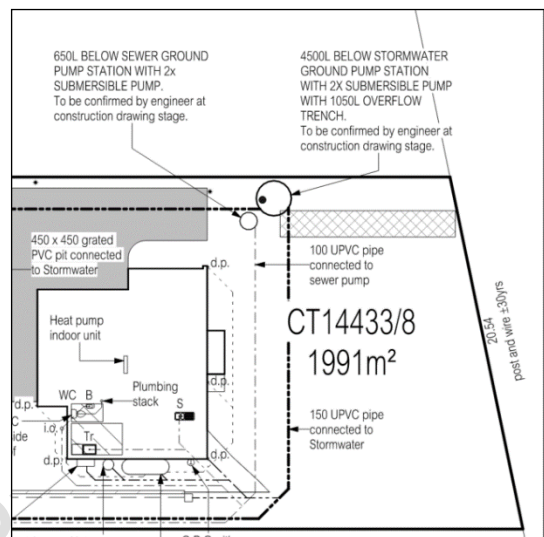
extract from ground floor drainage plan showing location of stormwater tank and pump.
